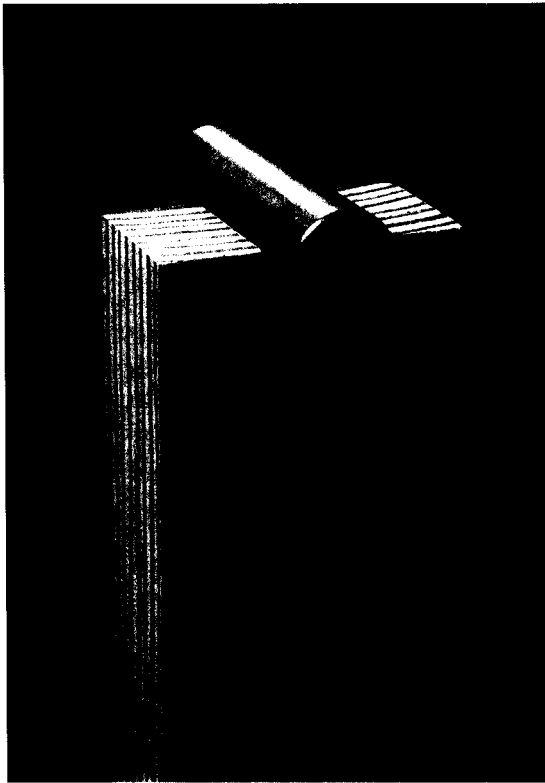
Dowel-bearing specimen with 12.7-mm (0.5-in.) diameter rod from Group 1 tests (M94 0123-10).
